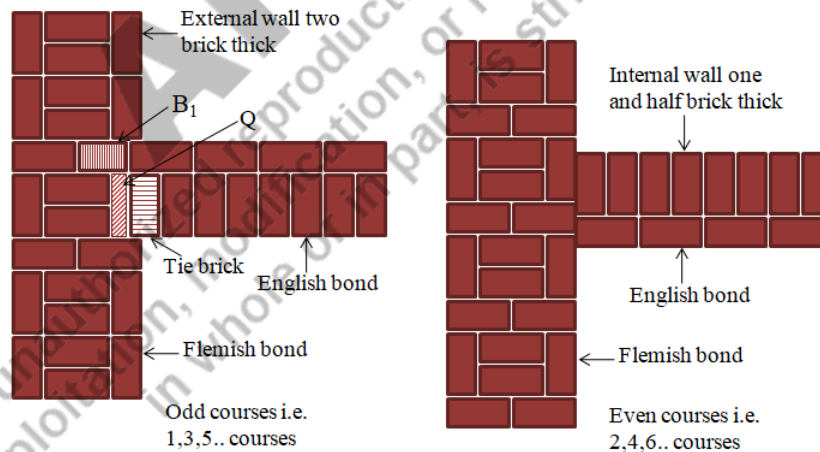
(b) Tee-junction between the one and a half brick thick internal wall in English bond and Two brick thick external wall in Double Flemish bond
